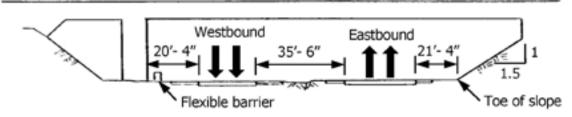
Bridge elevation view of horizontal clearances for separate westbound and eastbound highway features below the bridge, with flexible barrier.
